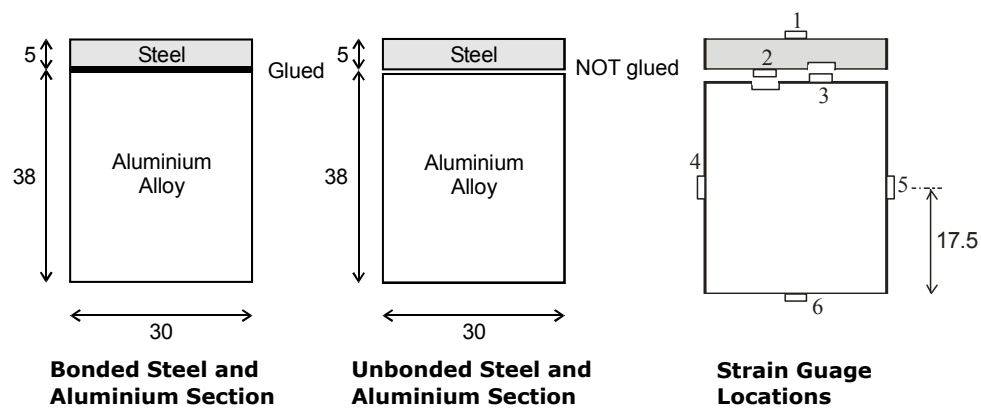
Bonded and unbonded composite beams (all dimensions in millimetres)
